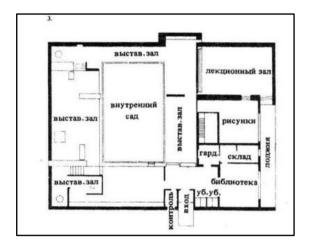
the plan and the cut of the picture gallery in Darmstadt. Architect T. Pabst.
